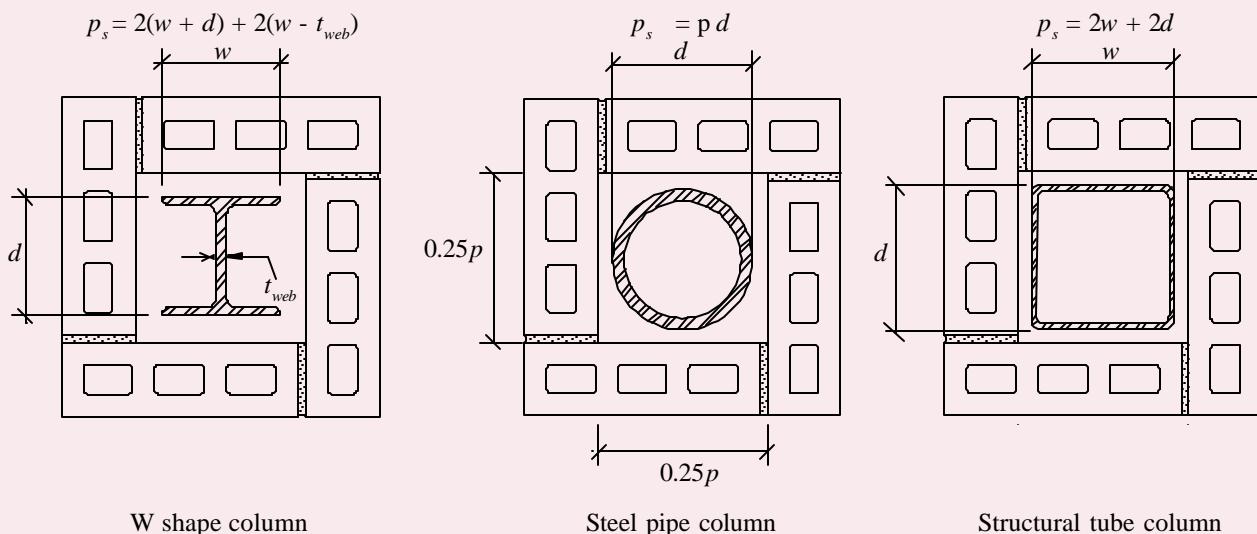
Details of Concrete Masonry Protection for Commonly Used Steel Columns (ref. 1)
